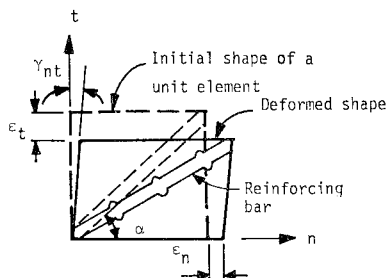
Deformed shape of a unit element of a reinforced concrete plate.
